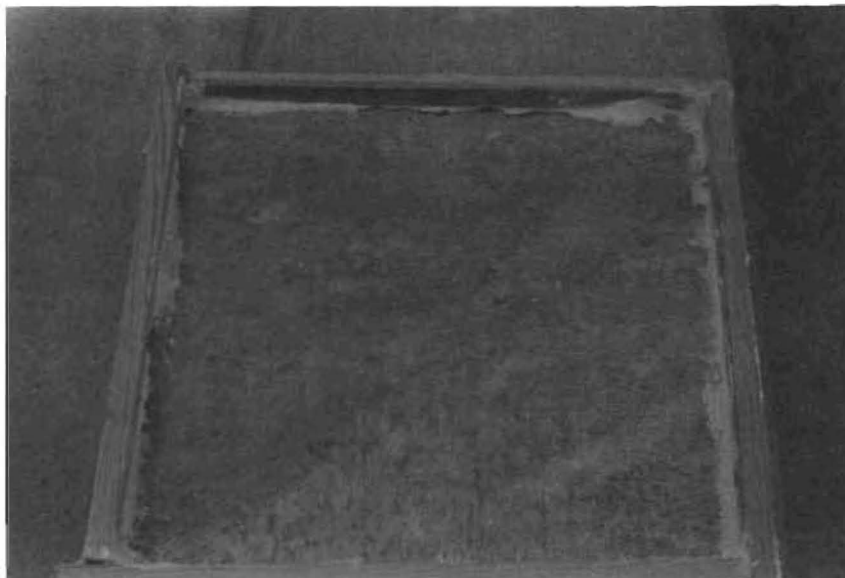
Concrete Slab with Wood Strip Applied.
